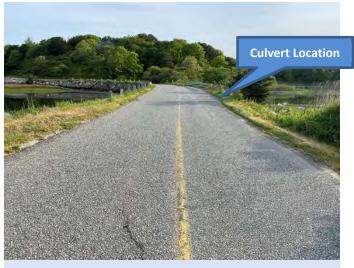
Mill Pond Culvert Roadway Approach (facing north)
